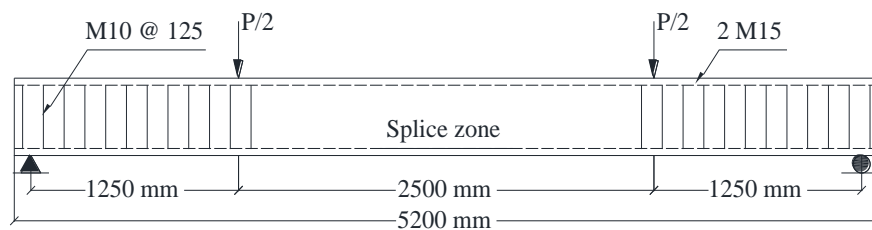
Details of the geometry and transverse reinforcement of the test beams
